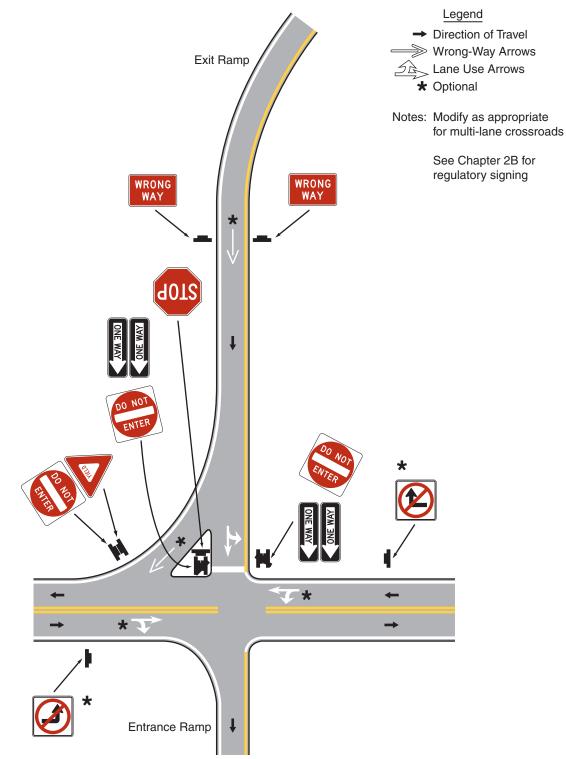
B-29. Examples of Arrow Markings at Entrance Ramp Terminals
